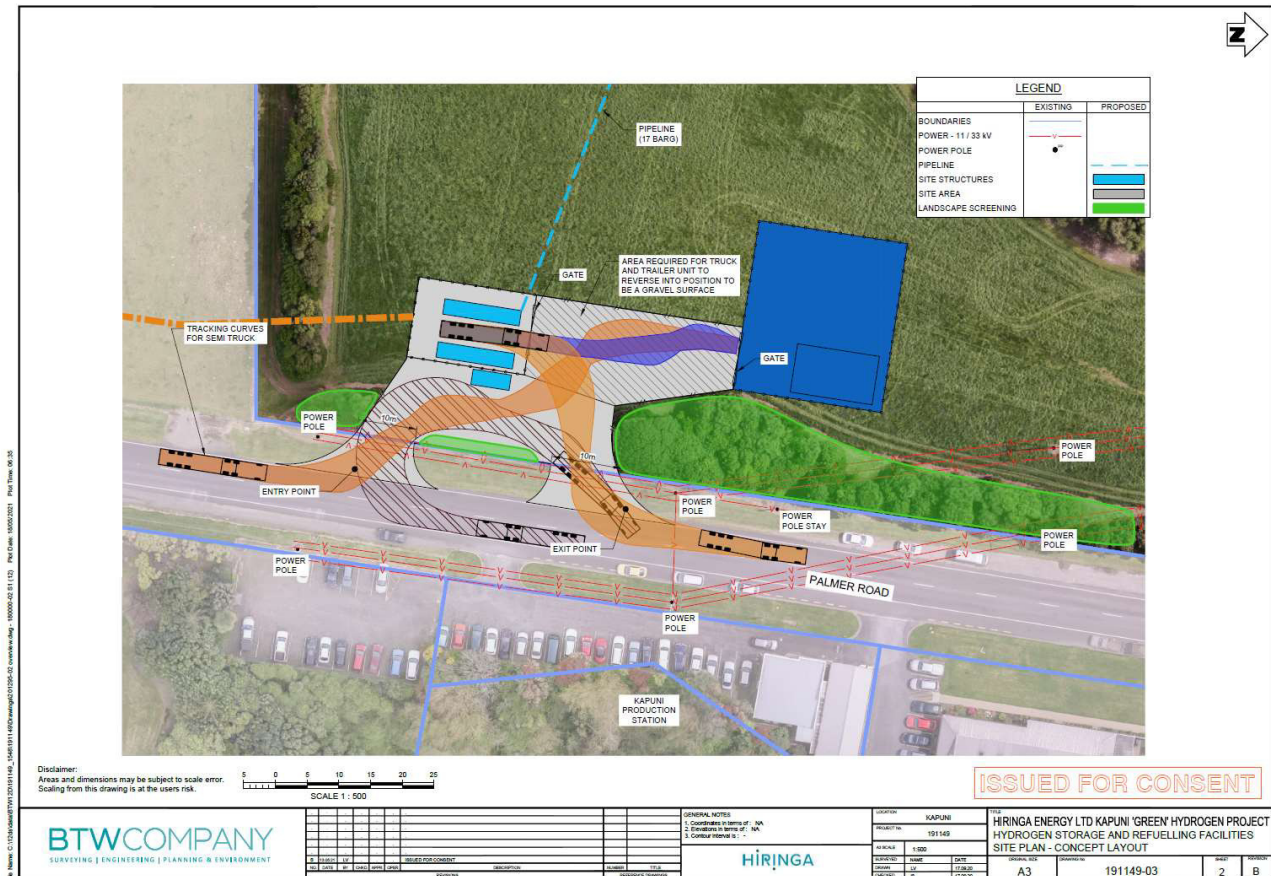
Palmer Road Hydrogen Storage and Refuelling Facilities (Extract from BTW Drawing 191149-02)
